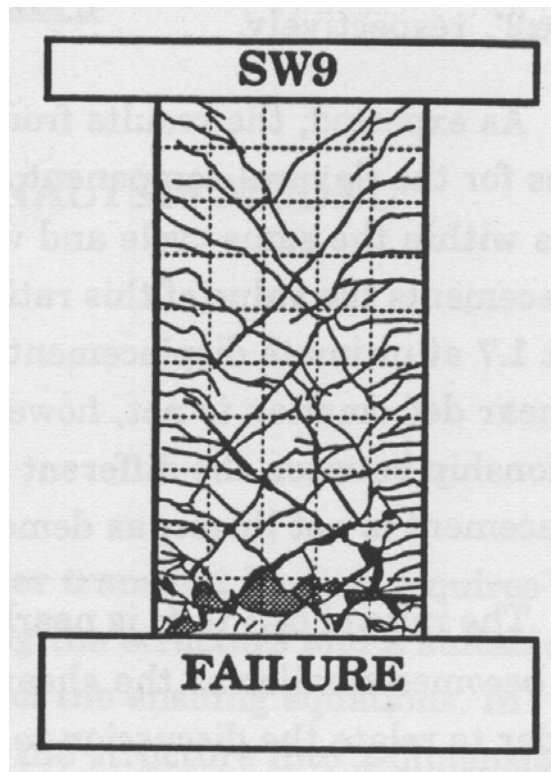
Condition of wall SW9 at 2.17% drift [Pilakoutas (1991)]
